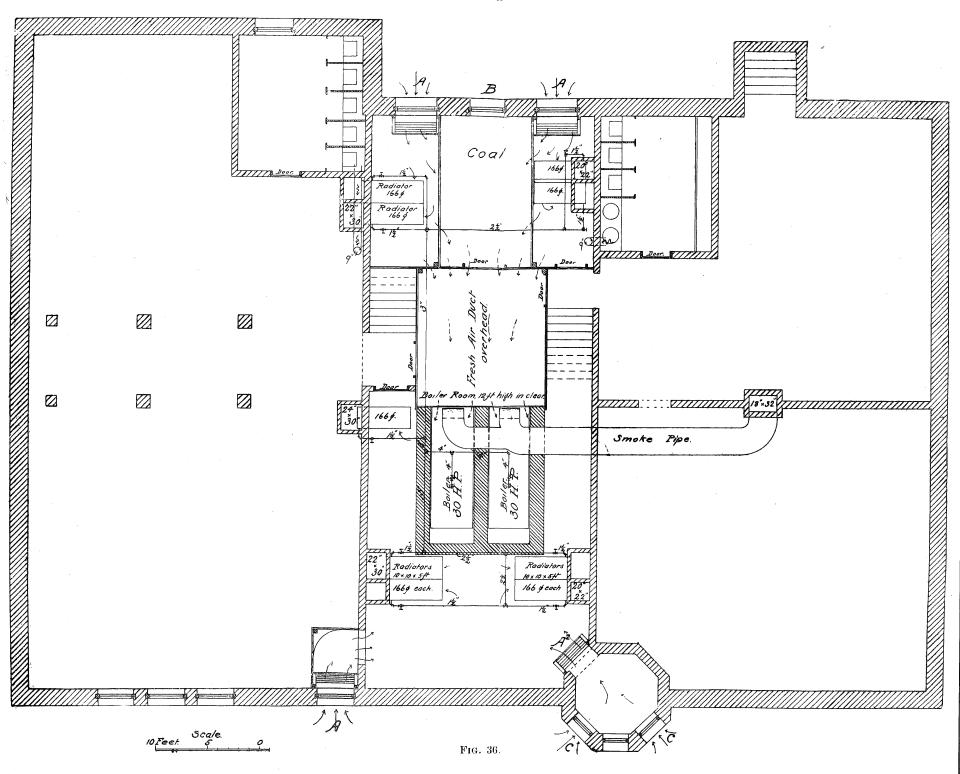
shows basement plan for an eight room building. space included between the corridor walls is appropriated to the purposes of heating and ventilation. It should have a clear height of at least twelve feet. Its floor should be of good concrete with facing of Portland cement. Its ceiling should be wire lathed and plastered. Within this space are shown two thirty horse power low pressure boilers, the fire-room and the coal-hold. The air inlets, provided with check valves, are shown at A, A, A, and C, C. ceilings of the coal-hold and of the fire-room should be two feet lower than the ceiling of the air chamber, so that a passage of large area may be provided for air movement between the front and the rear parts of the chamber. The stairways to the playrooms are separated from the air chamber by the partitions shown, and doors placed in those partitions are available for use in warming the building by the rotation method.
